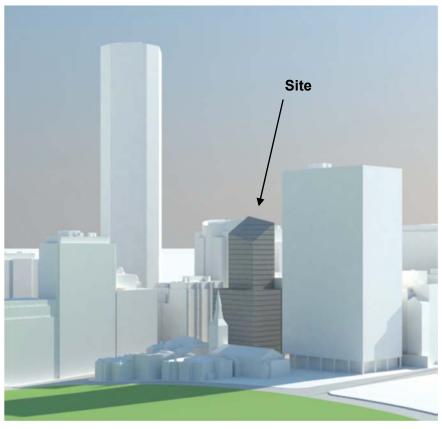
Building envelope with 8m setback from Elizabeth Street and 6m setback from Phillip and King Streets, as viewed from Hyde Park.
